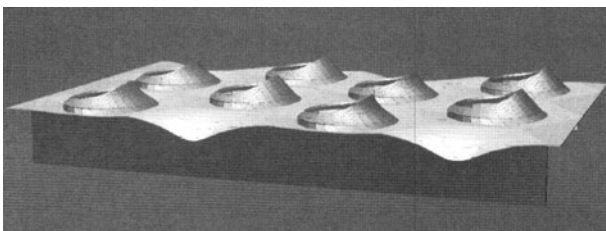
Stuttgart 21, computer rendering showing staggered individual shell units [16]
